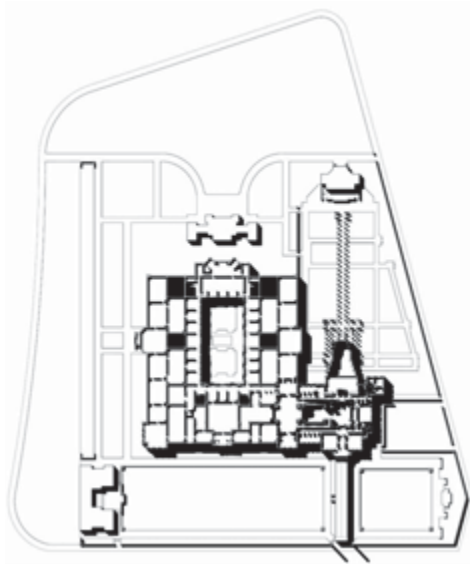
Alessandro Dalla Caneva, first floor of the
